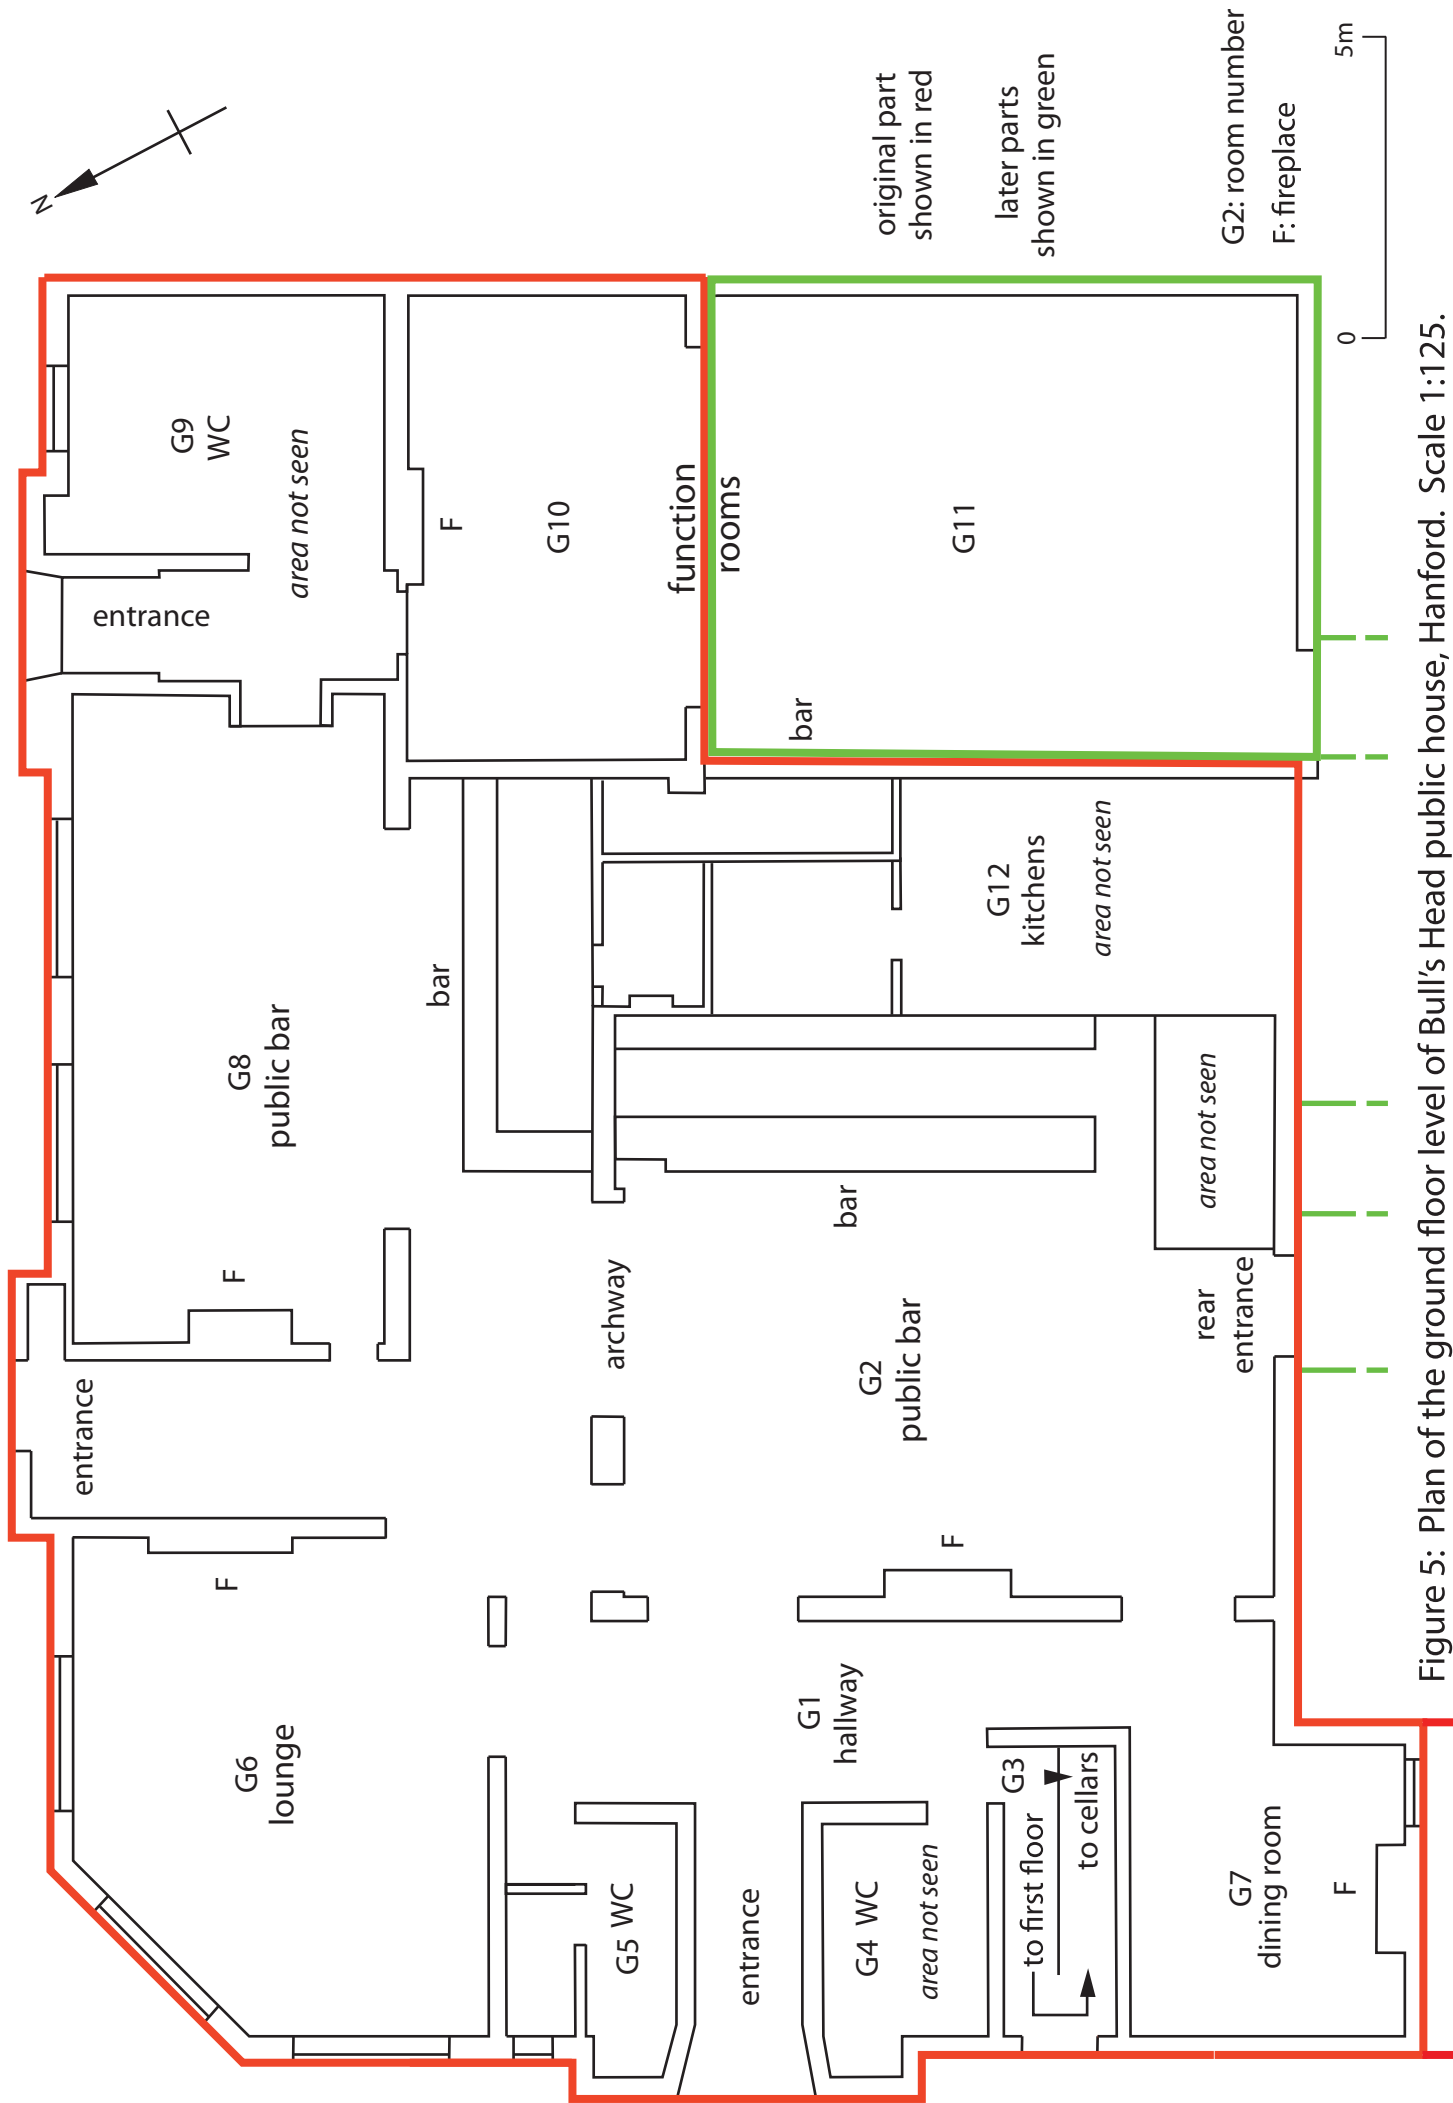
Plan of the ground floor level of Bull's Head public house, Hanford. Scale 1:125.
